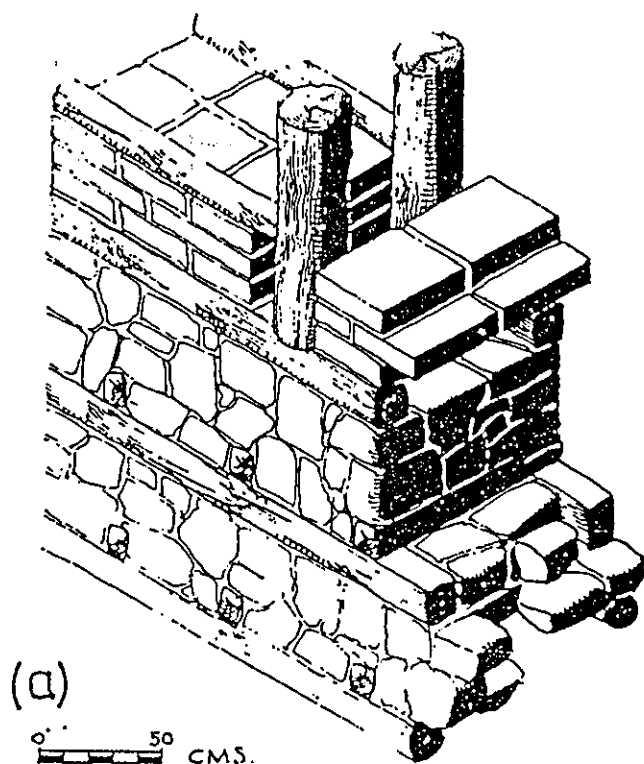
Antiseismic foundation and walling found in Asia minor.
